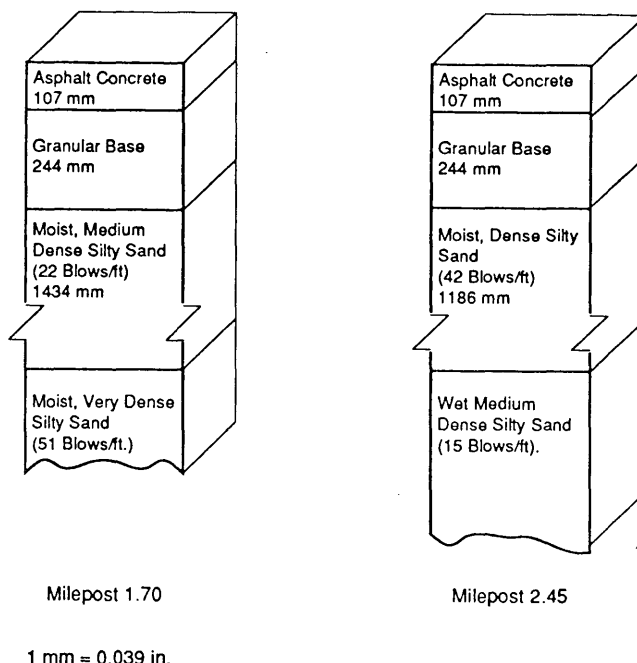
Cross section for SR-525 pavement sections, MP 1.70 and 2.45.
